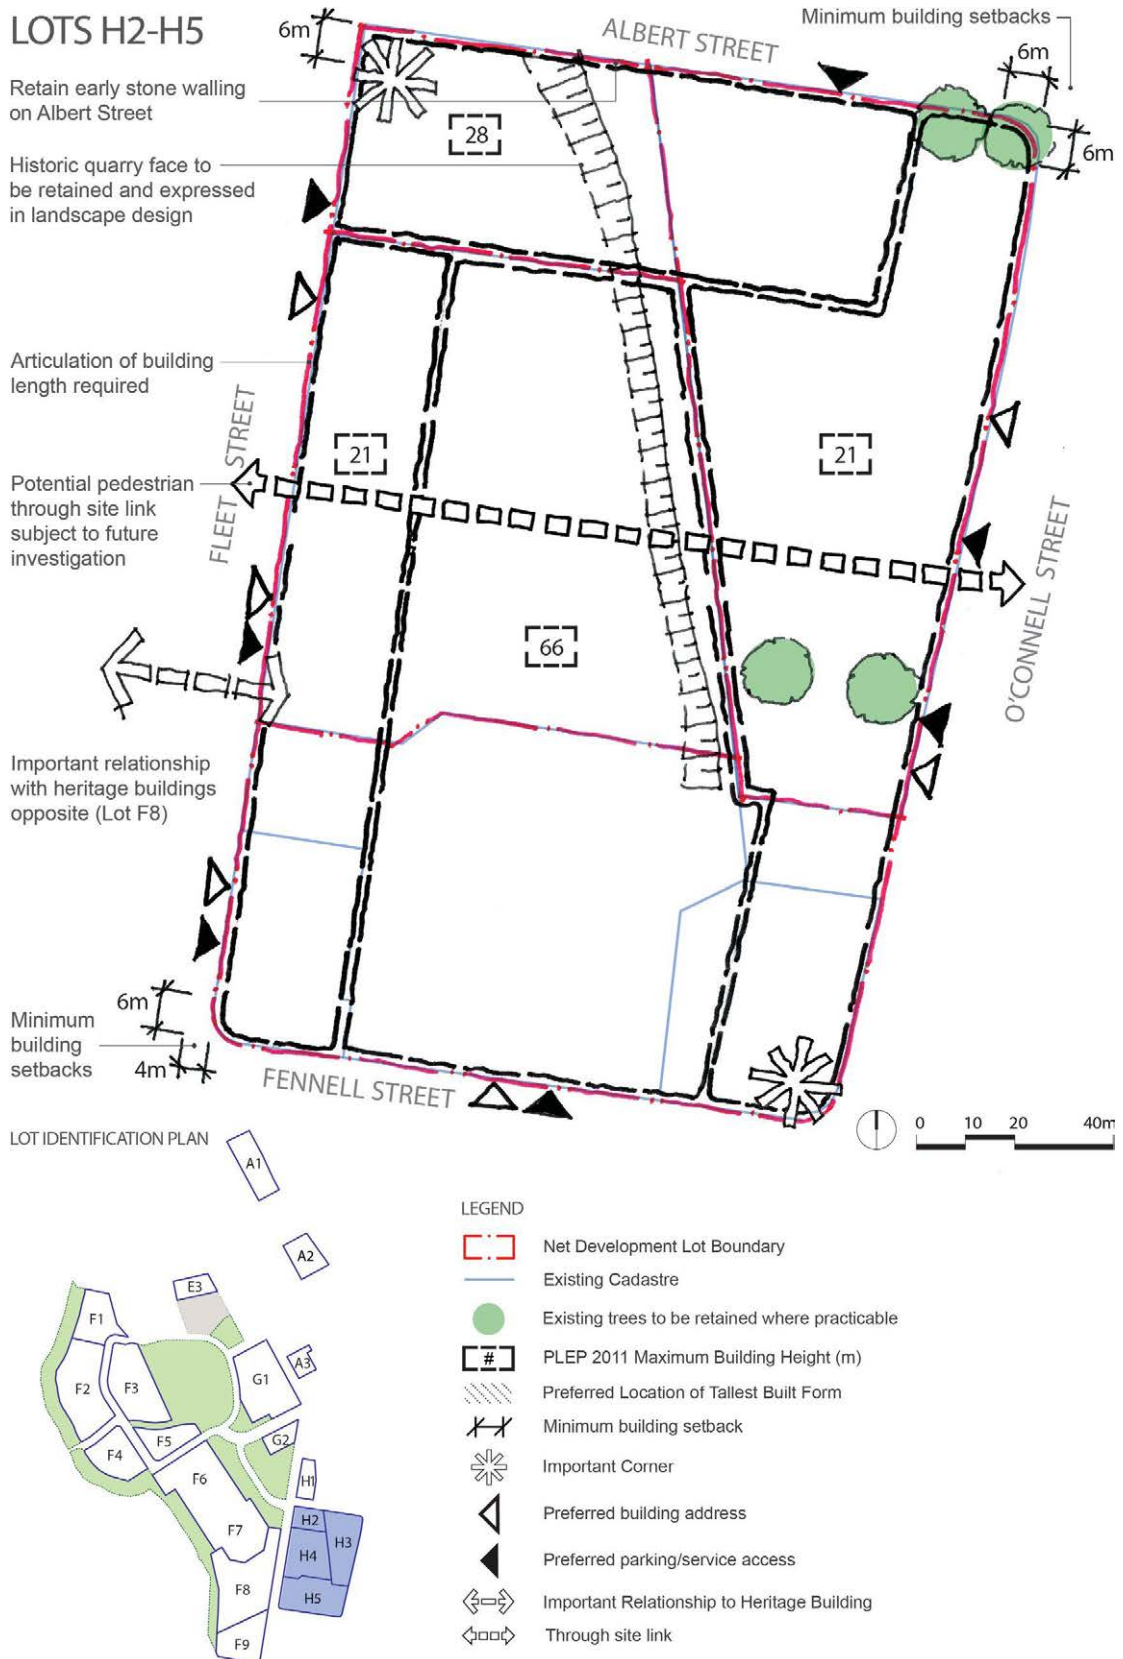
Development Lots H2 – H5
